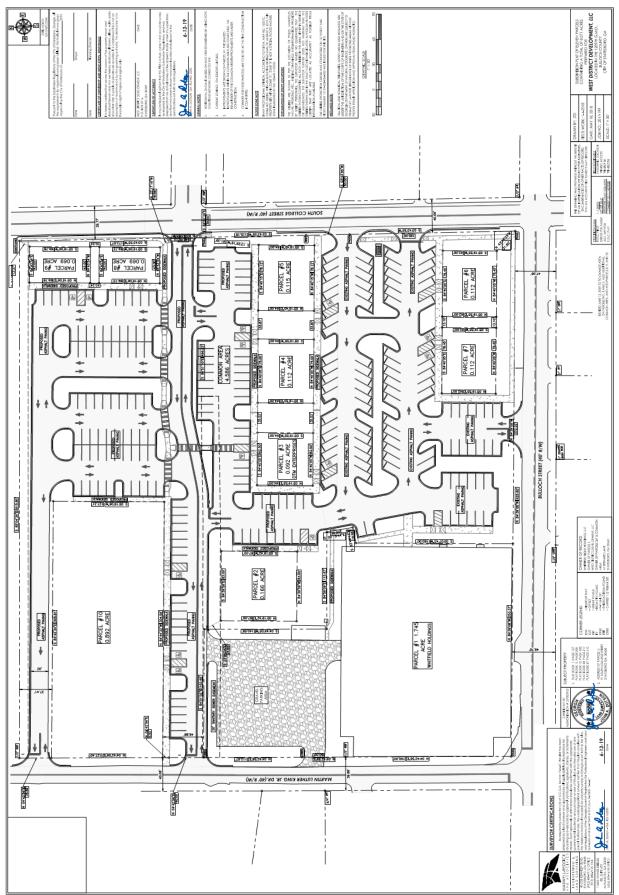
EXHIBIT C: PROPOSED ARCHITECTURAL DRAWINGS (CONT'D)
